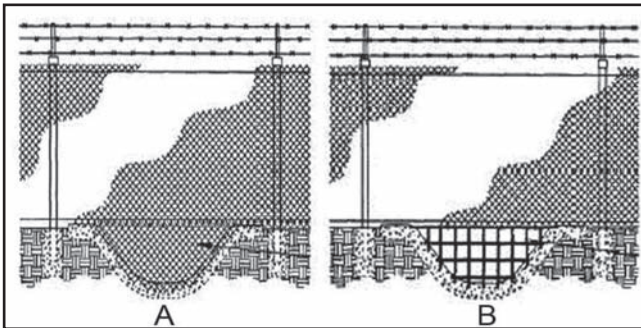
Under-fence utility openings. A: Swale crossing with ground stakes; B: Bar grill embedded in concrete. (MIL-HDBK-1013/10)
